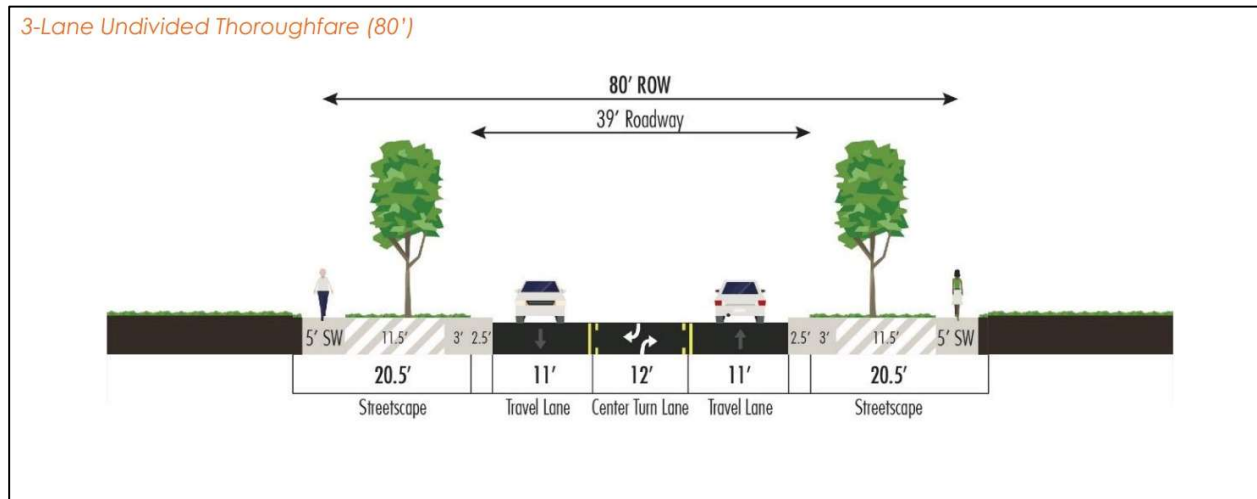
Three-Lane Undivided Thoroughfare Cross-Section
